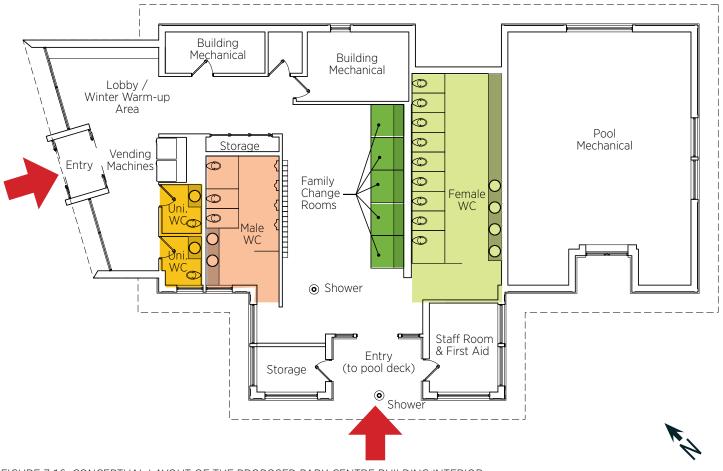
CONCEPTUAL LAYOUT OF THE PROPOSED PARK CENTRE BUILDING INTERIOR
